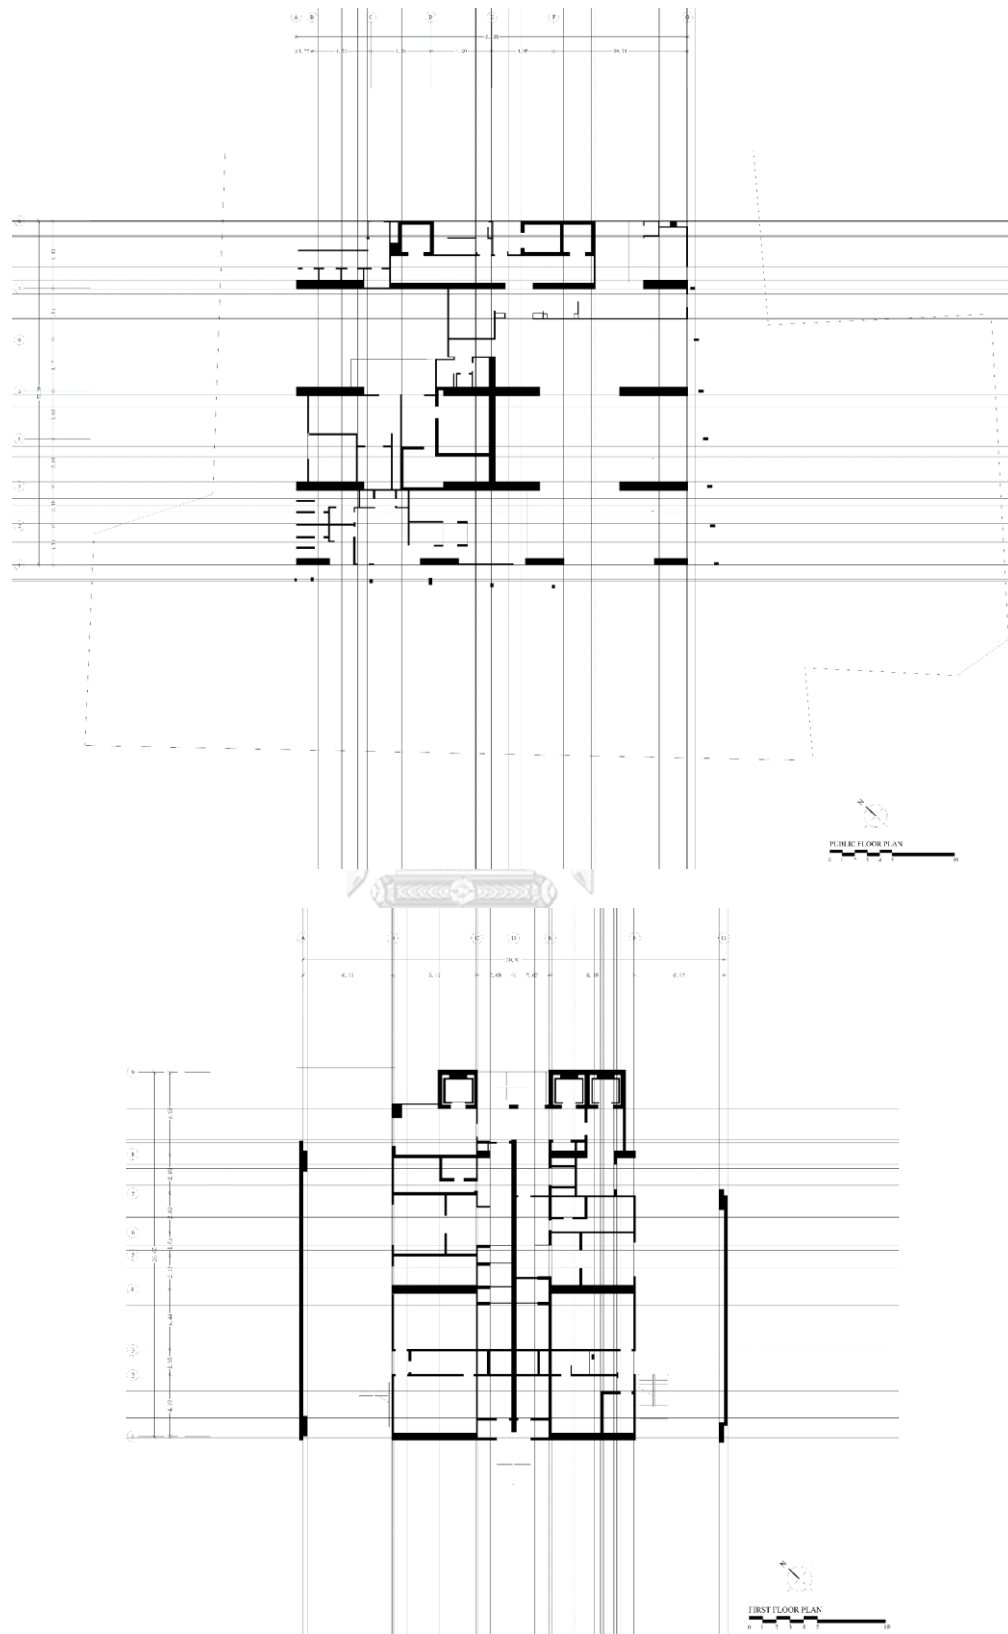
Main floor plan and first floor plan (residential plan) of WINDSHELL Naradhiwas, redrawn by the author.
